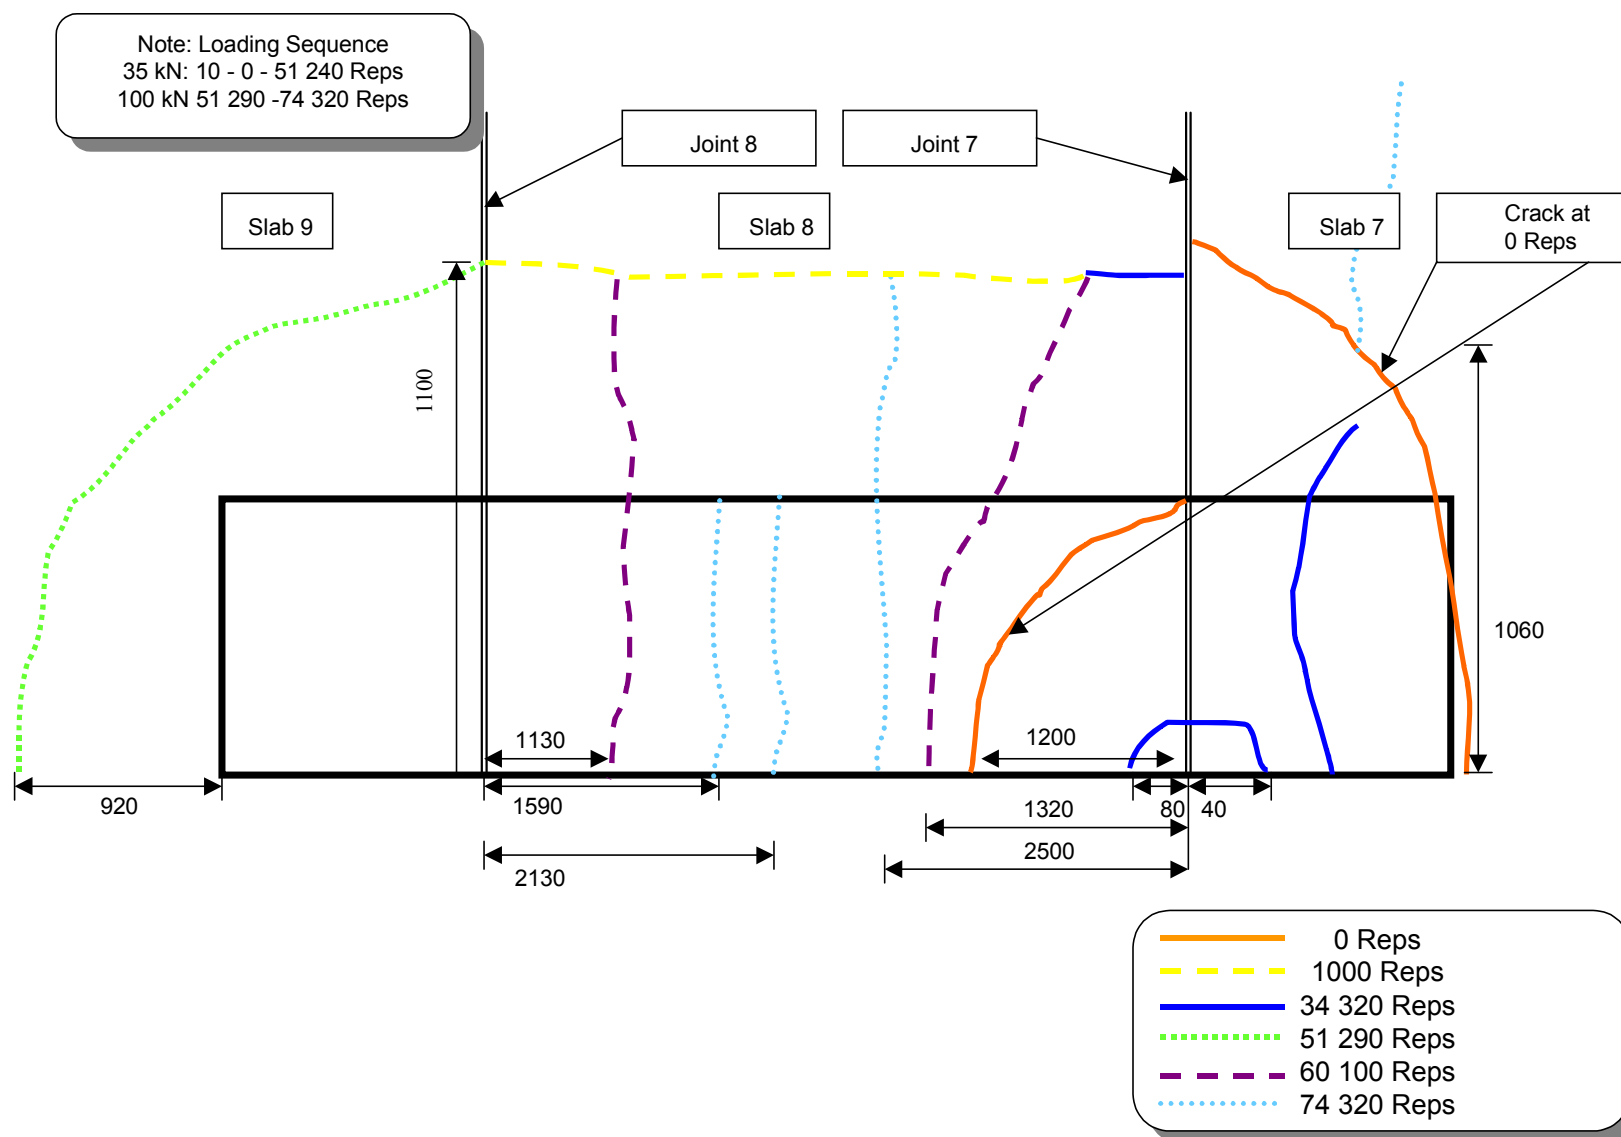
Schematic of crack development, Test Section 520FD (not to scale).
